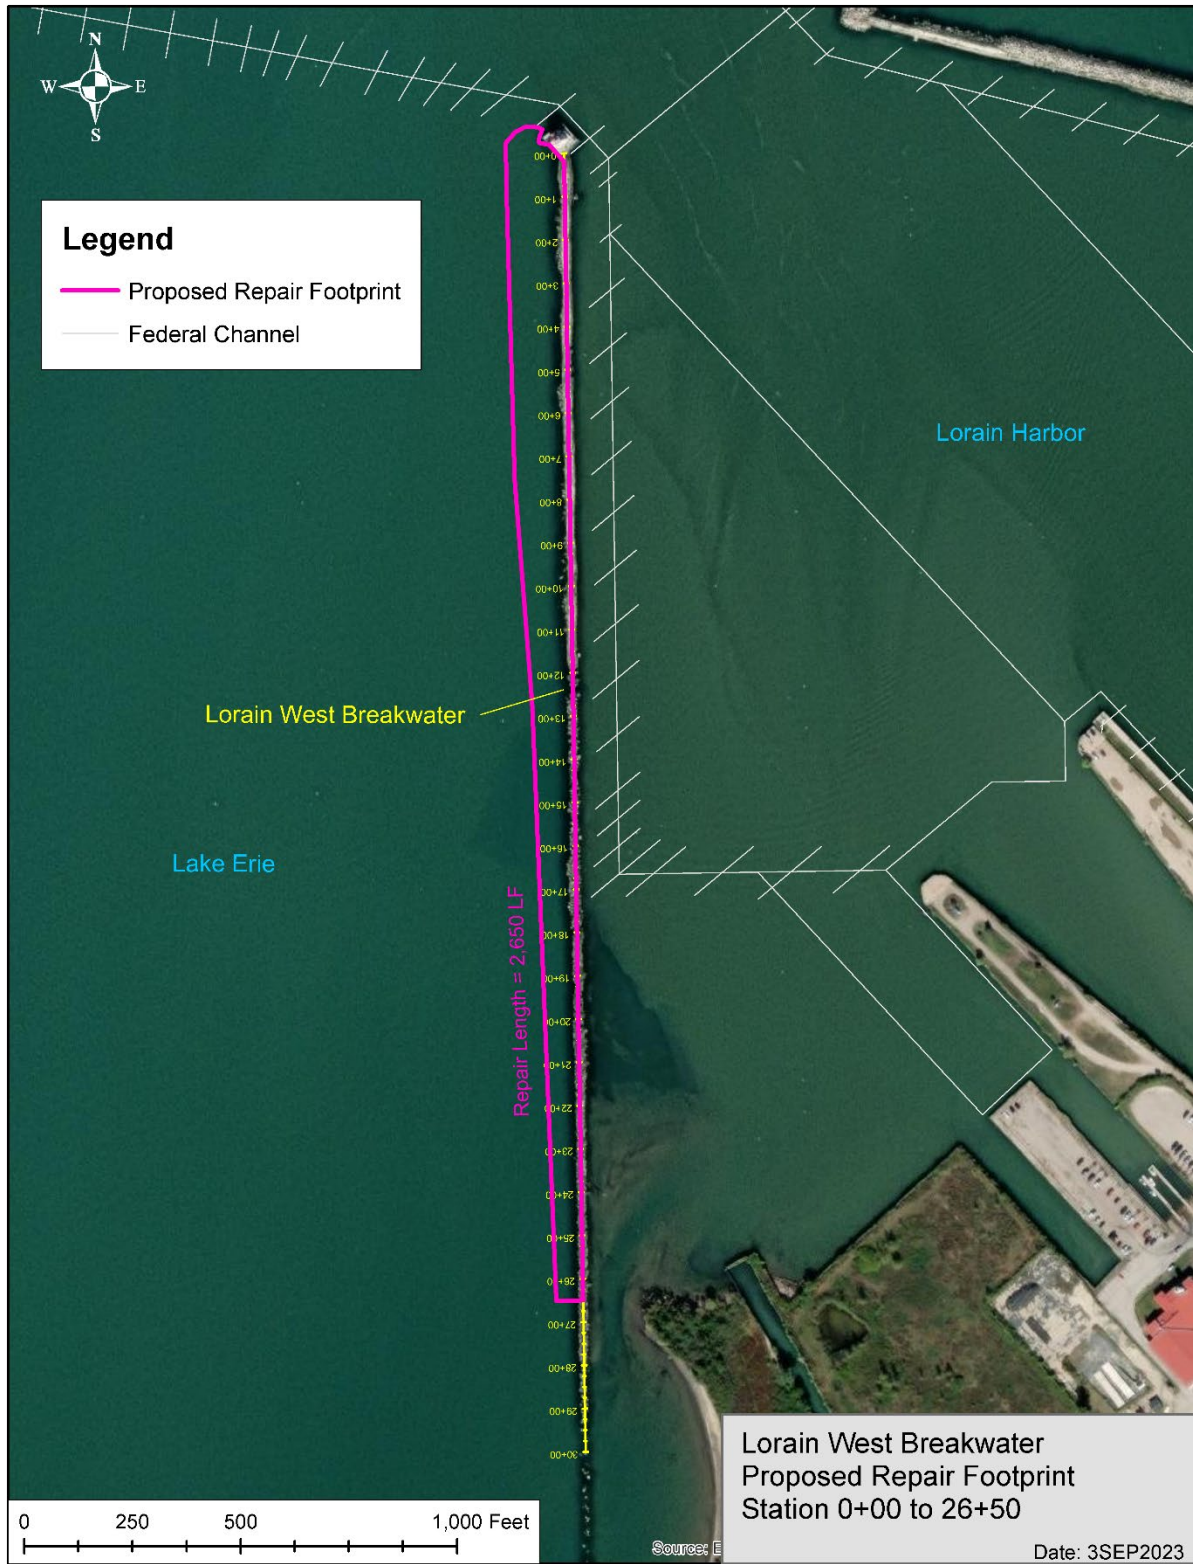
Lorain West Breakwater Proposed Repair Footprint
